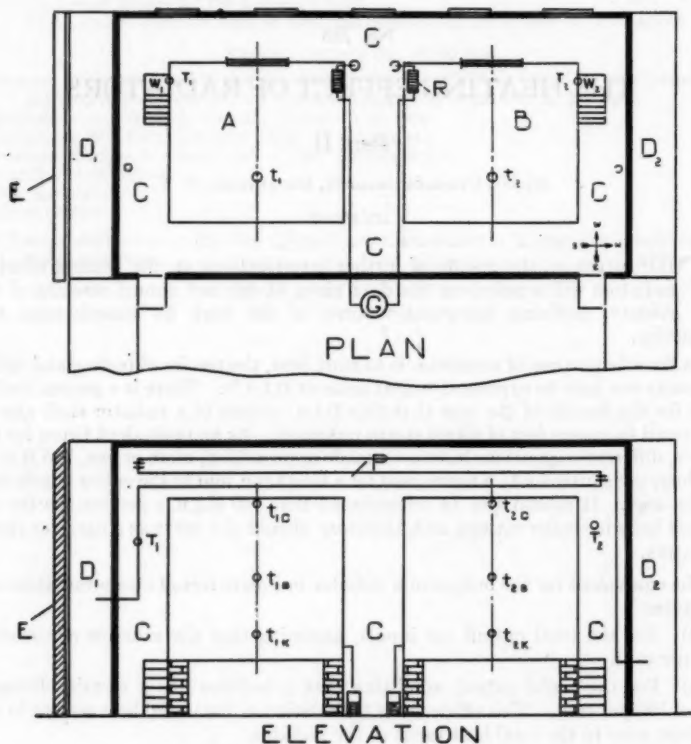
PLAN AND ELEVATION OF TEST ROOMS
